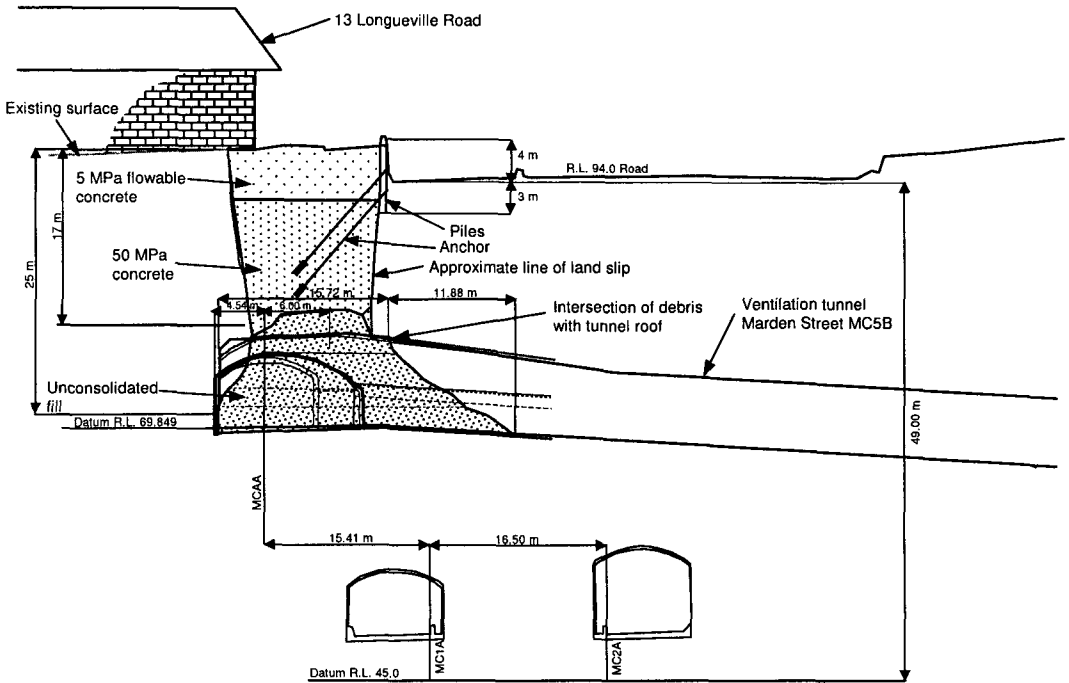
Vertical section through the Lane Cove Tunnel incident site following the concrete pours.
